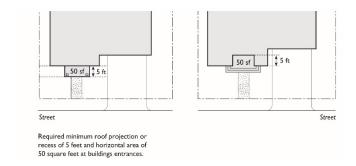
D.3.eB(1): BUILDING ENTRANCE PROJECTION OR RECESS
